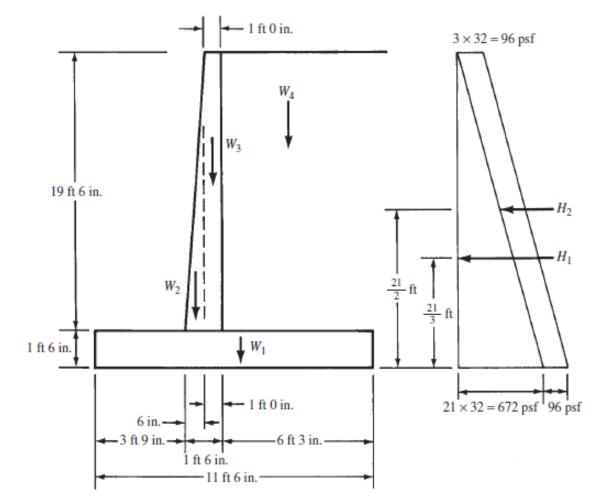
Forces acting on retaining wall for Example 13.3.
